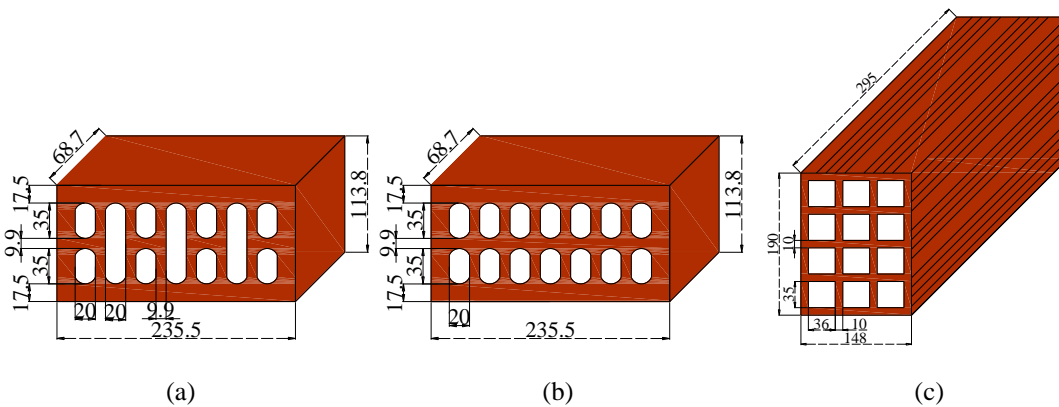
Typical brick units used in masonry (a) and (b) veneer and (c) infill walls (dimensions in millimetres).
